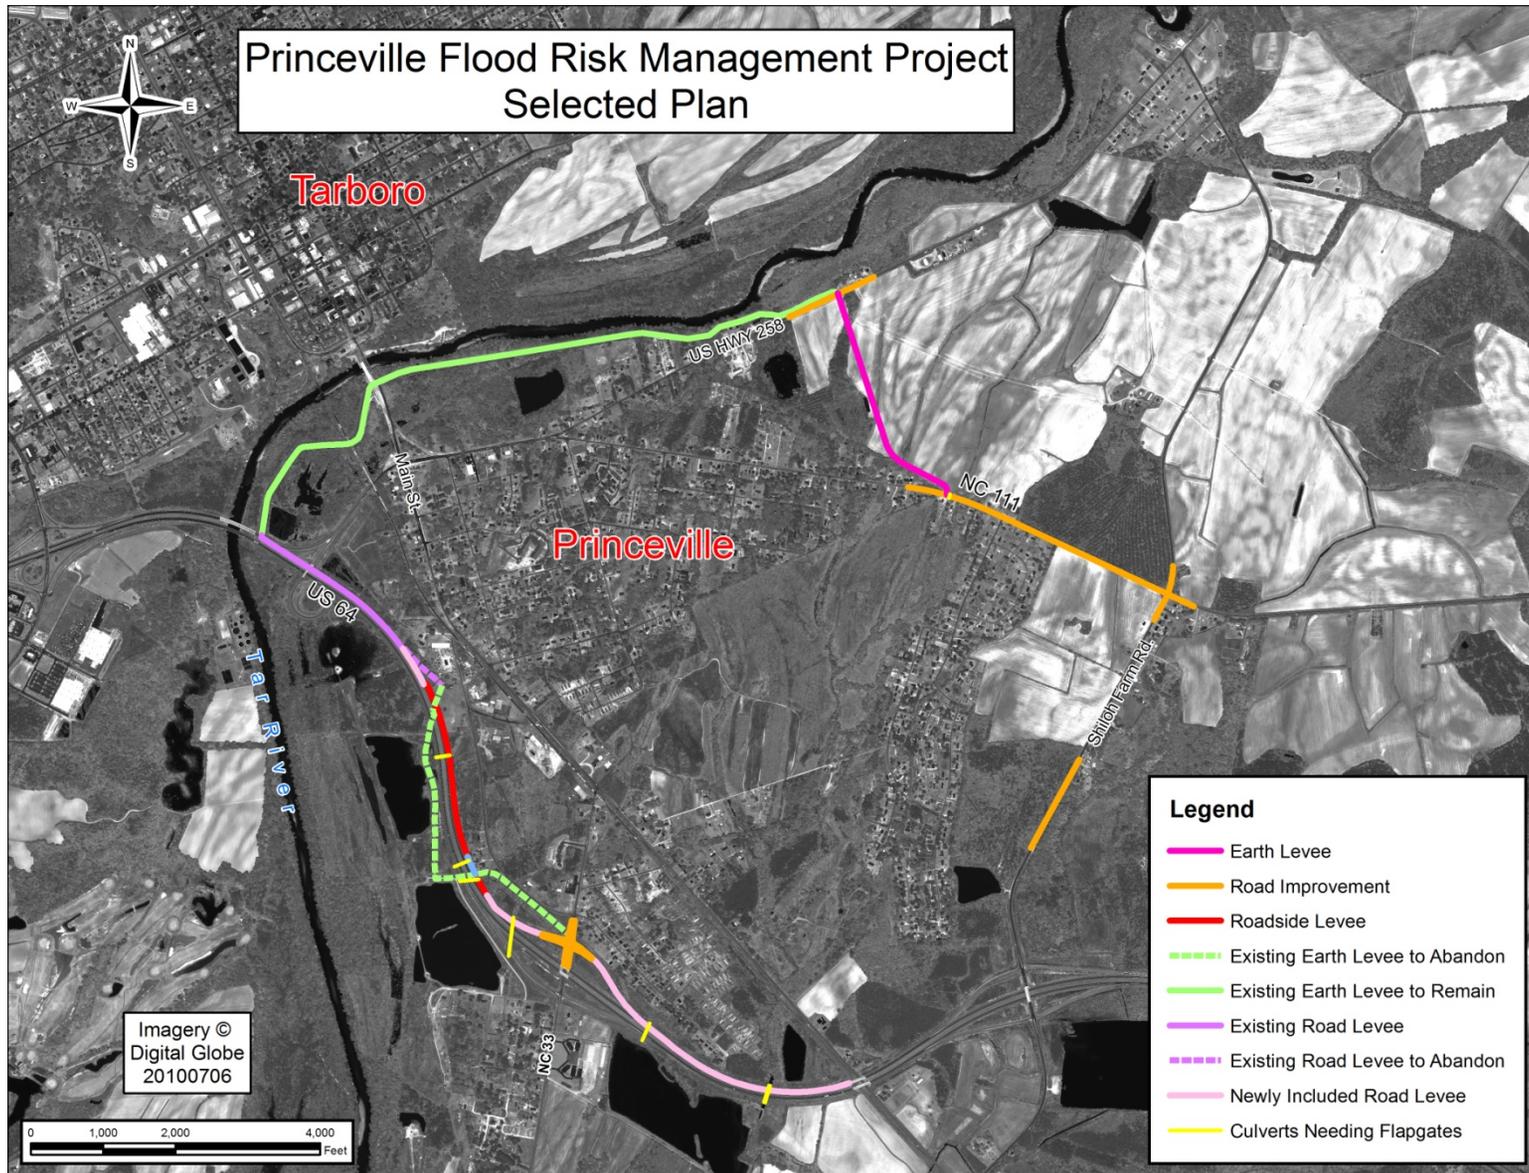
Levee Extension Layout for Selected Plan
